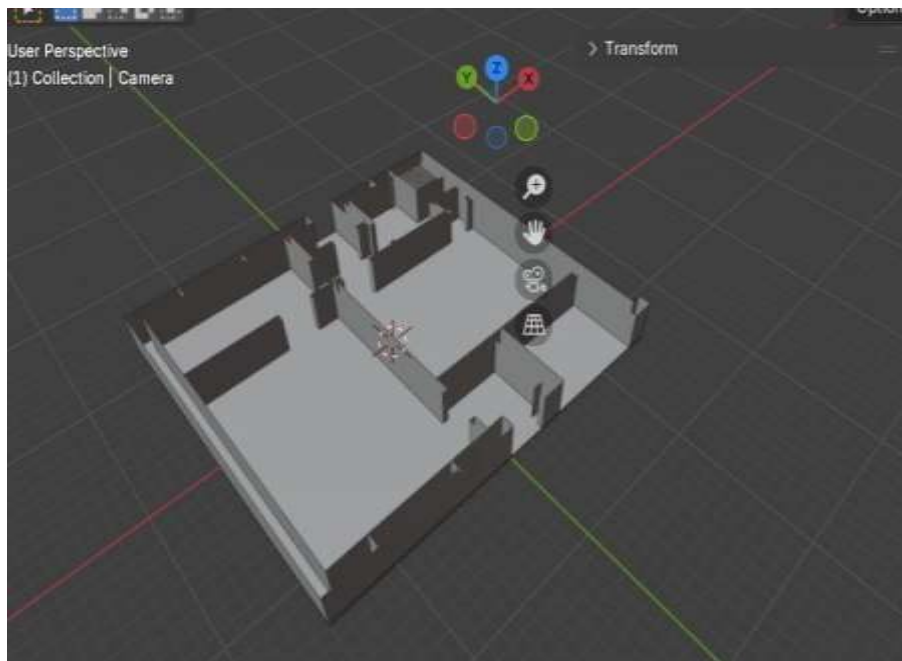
Single-floor 3D building model generated from DXF blueprint.
